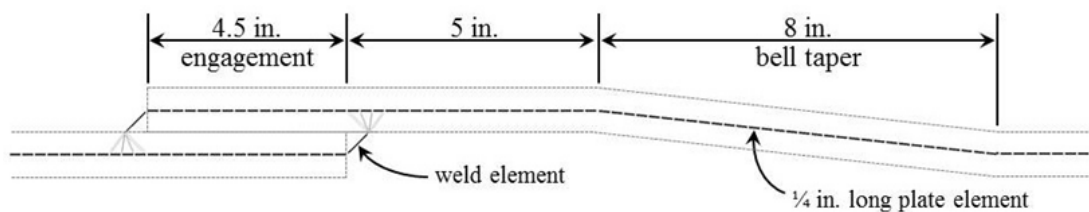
Detail View of Joint Region Geometry. (The outline of pipe wall is shown in gray.)
